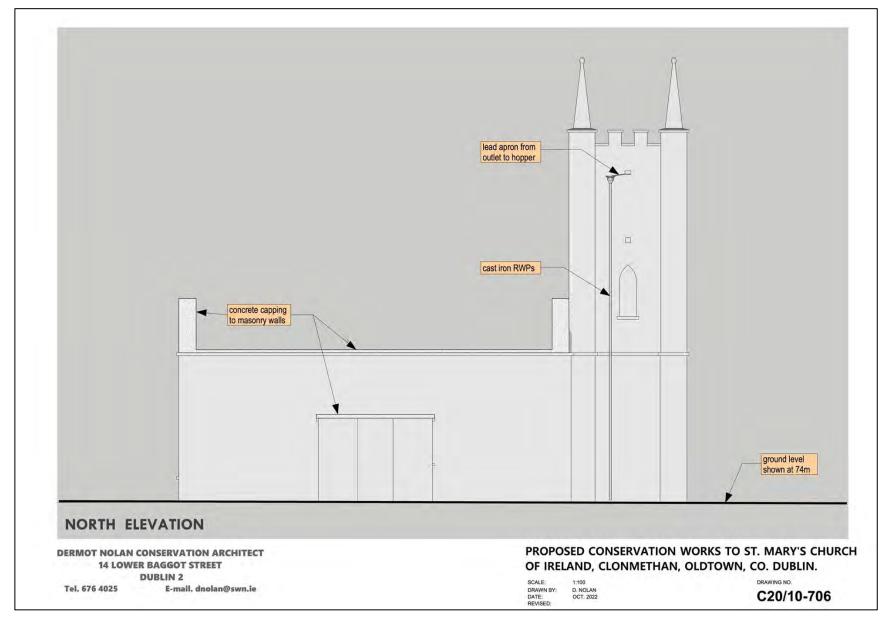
North elevation of St Mary's Church (Nolan 2022).
